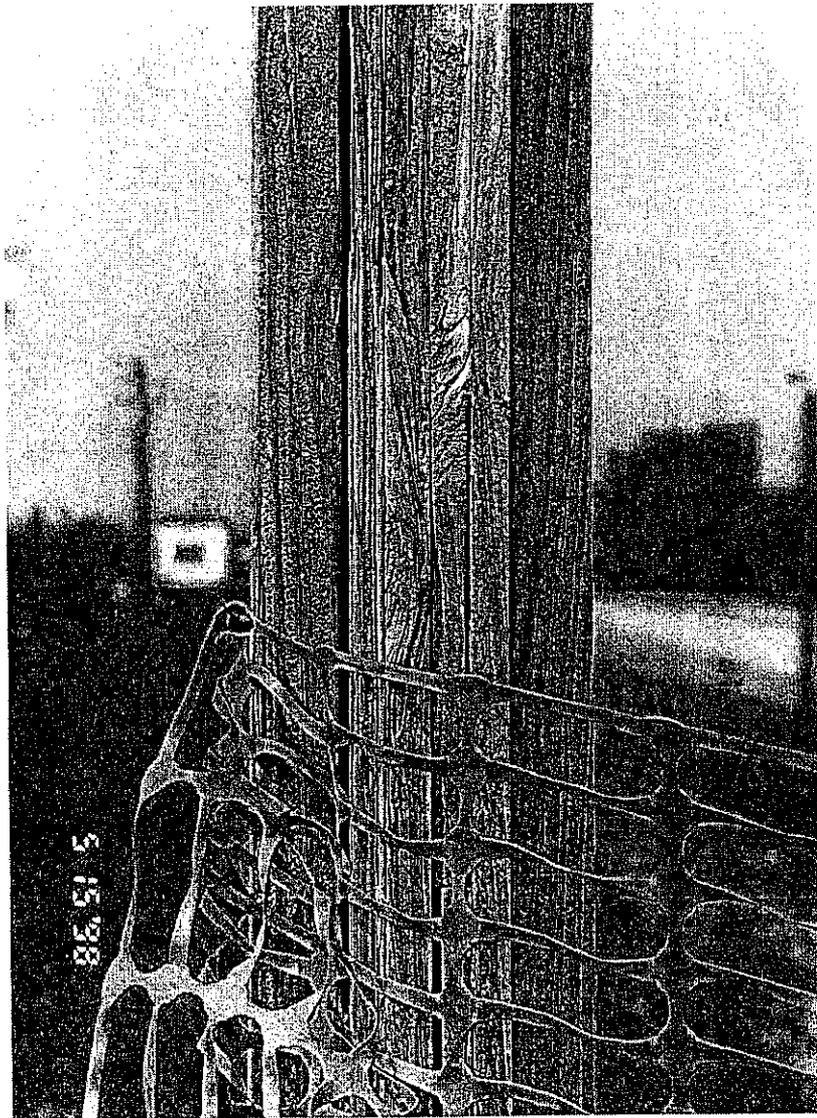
Glue-laminated wood, cross-sectional view Bolingbrook, IL.
